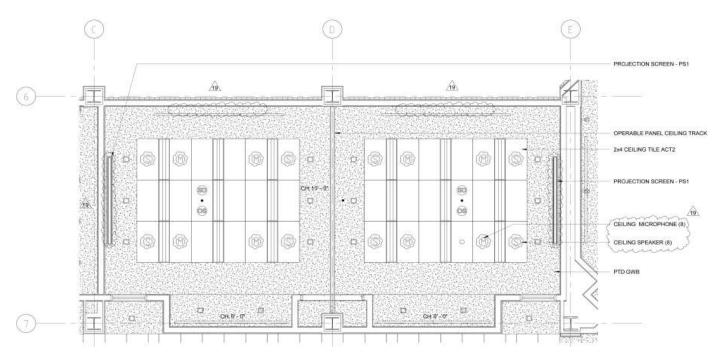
Seminar Rooms Reflected Ceiling Plan.
